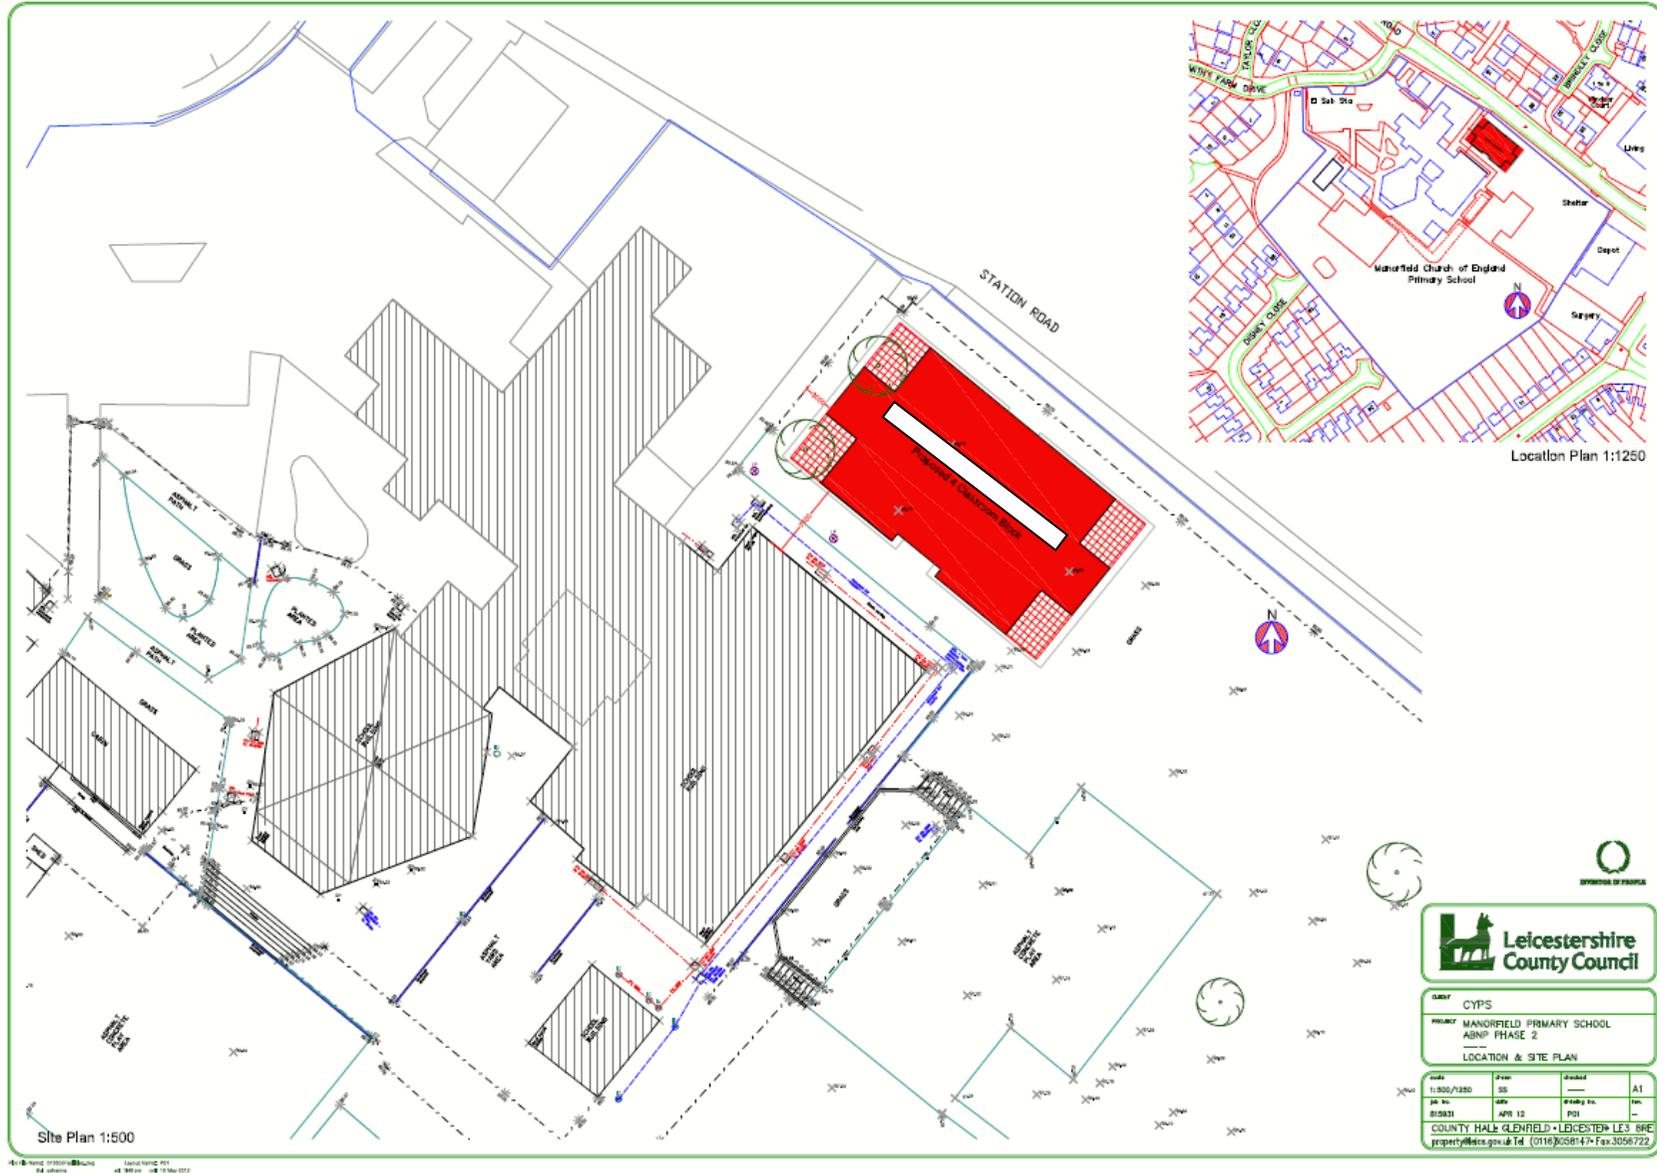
Site Plan (NTS) with indicative trench position (in white).
